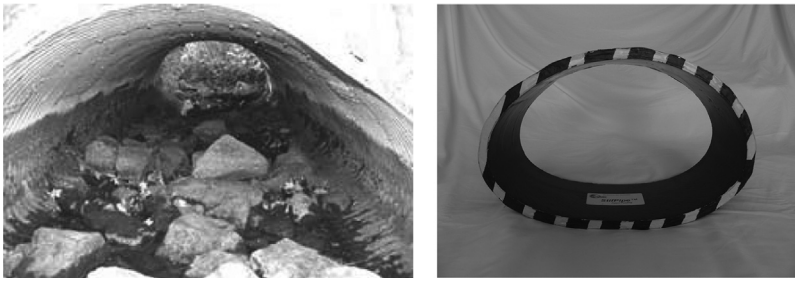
(a) A corroded oval-shaped corrugated metal pipe culvert requiring repair and (b) a custom-made honeycomb-FRP (fiber-reinforced polymer) pipe can match the shape of the culvert to minimize the loss of flow.
